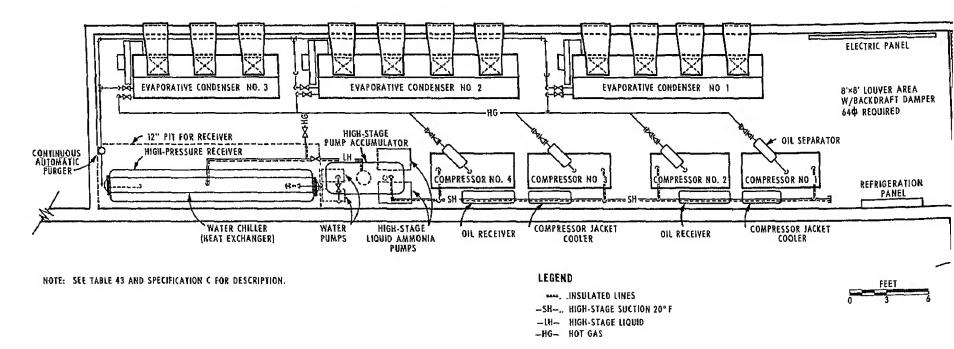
Situation III, Building No. 1, central-system equipment room.
